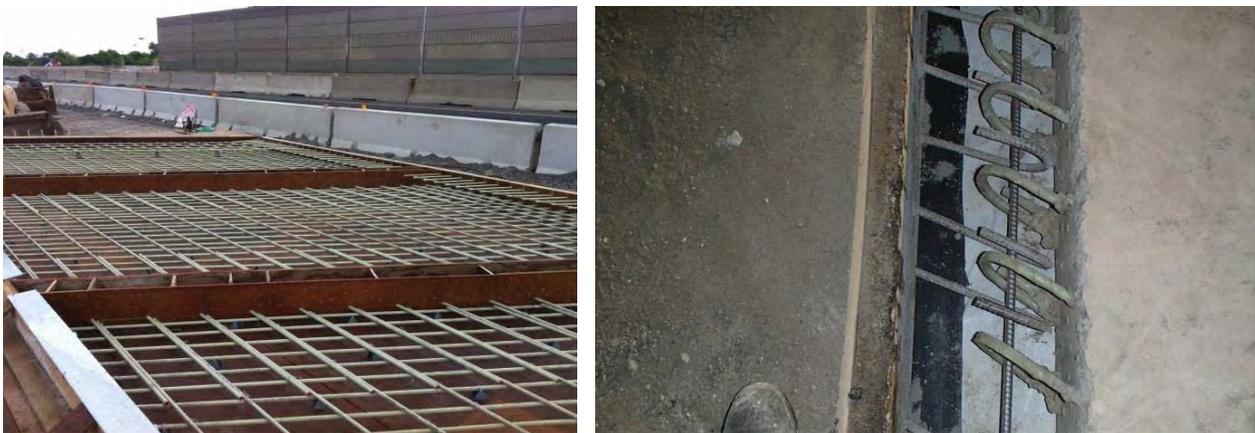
Construction of approach slab panels (in a staging yard) (left) and view of transverse closure strip at the semi-integral deck end. (Photographs courtesy of AECOM)
